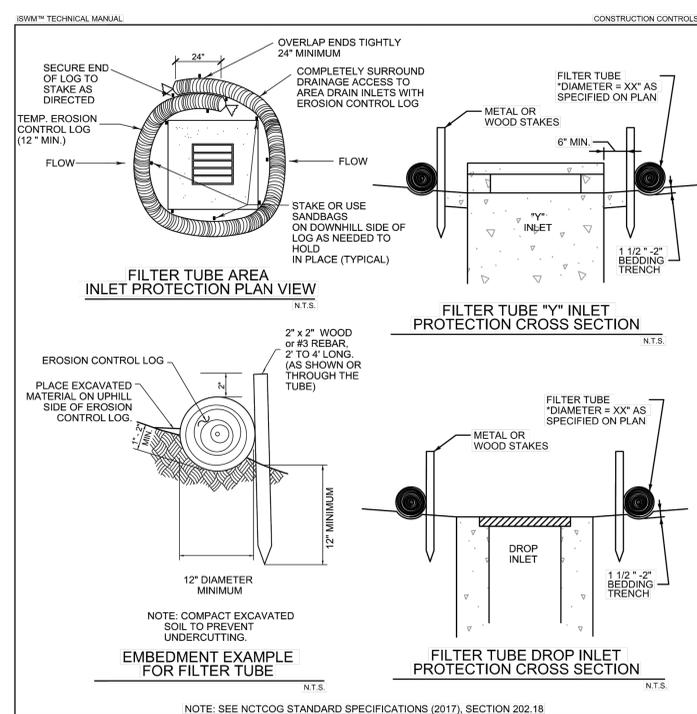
STANDARD CONSTRUCTION DETAIL - FILTER TUBE AREA INLET PROTECTION
